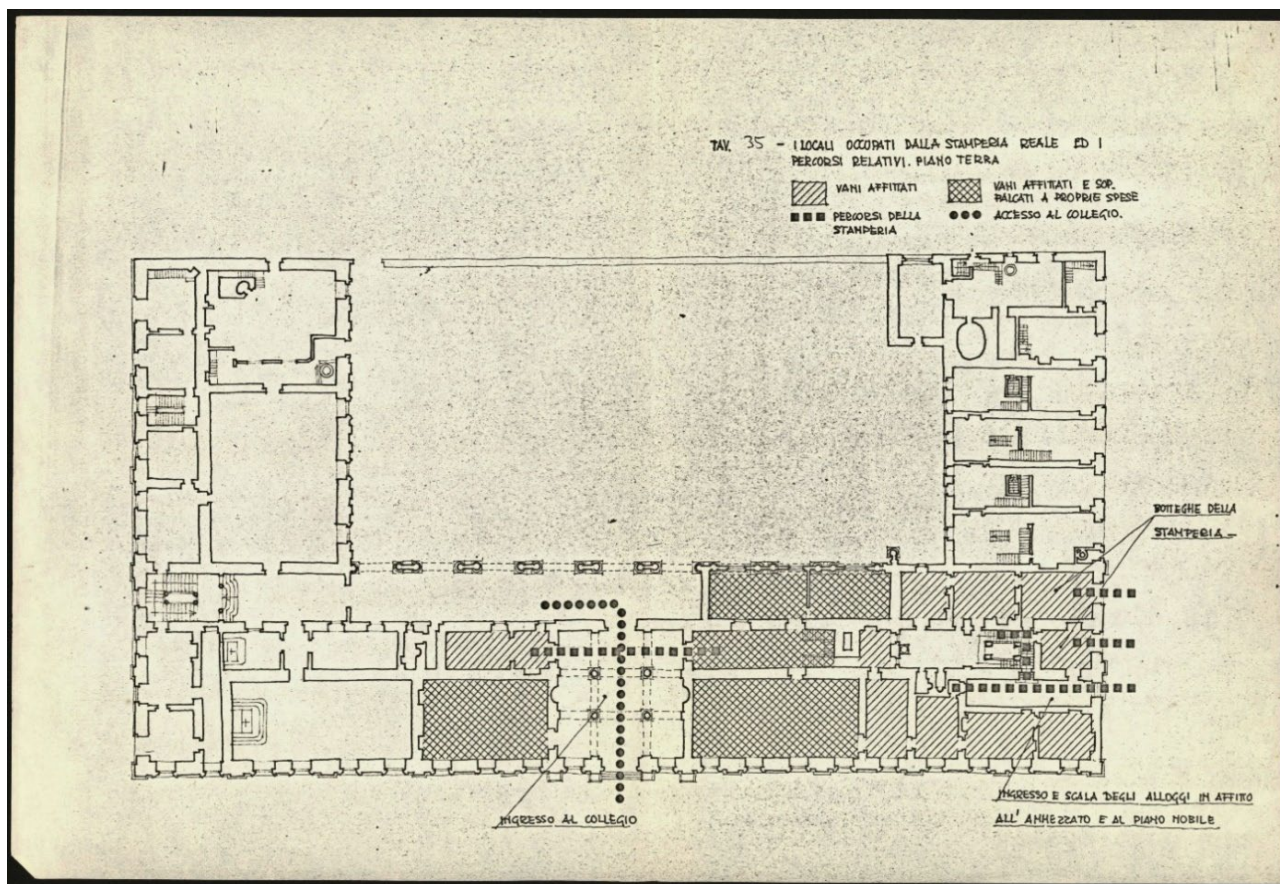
Plan of the ground floor of the *Palazzo del Collegio dei Nobili* (1773). Source: State Archive of Turin.
